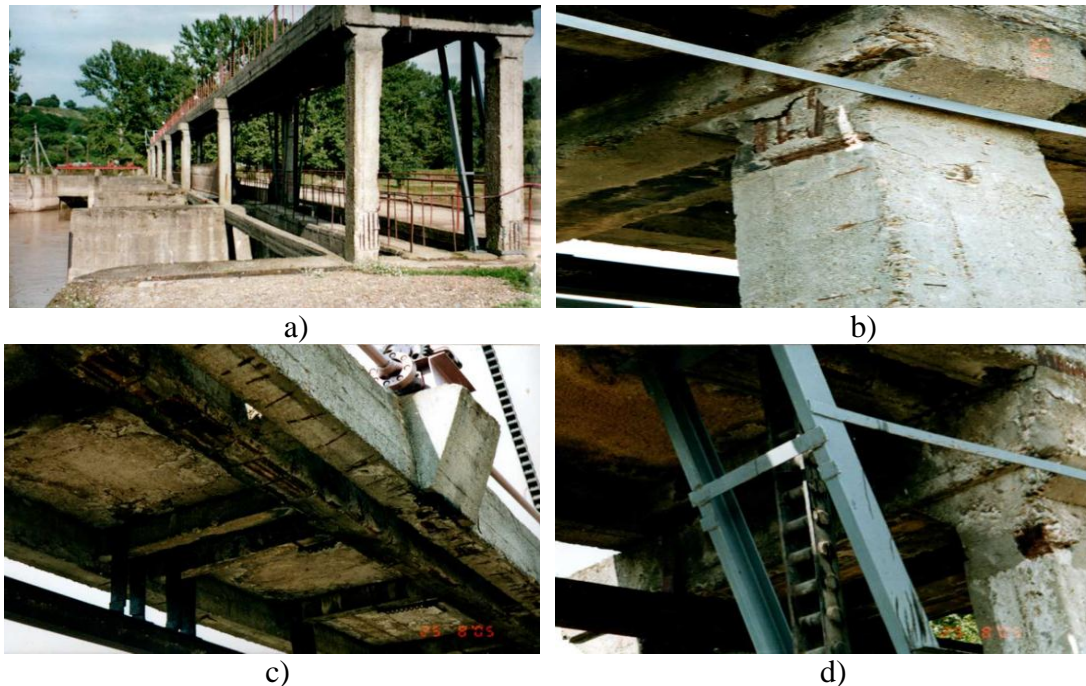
Corrosion destruction of reinforced concrete overpass structures at the Pridnestrovian hydroelectric power station (Ivano-Frankivsk region, 1985):
